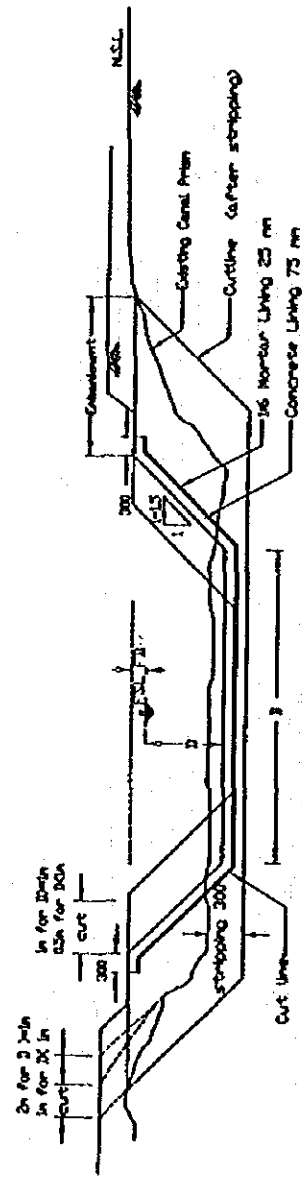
1 Typical Cross Section of Lined Canal
